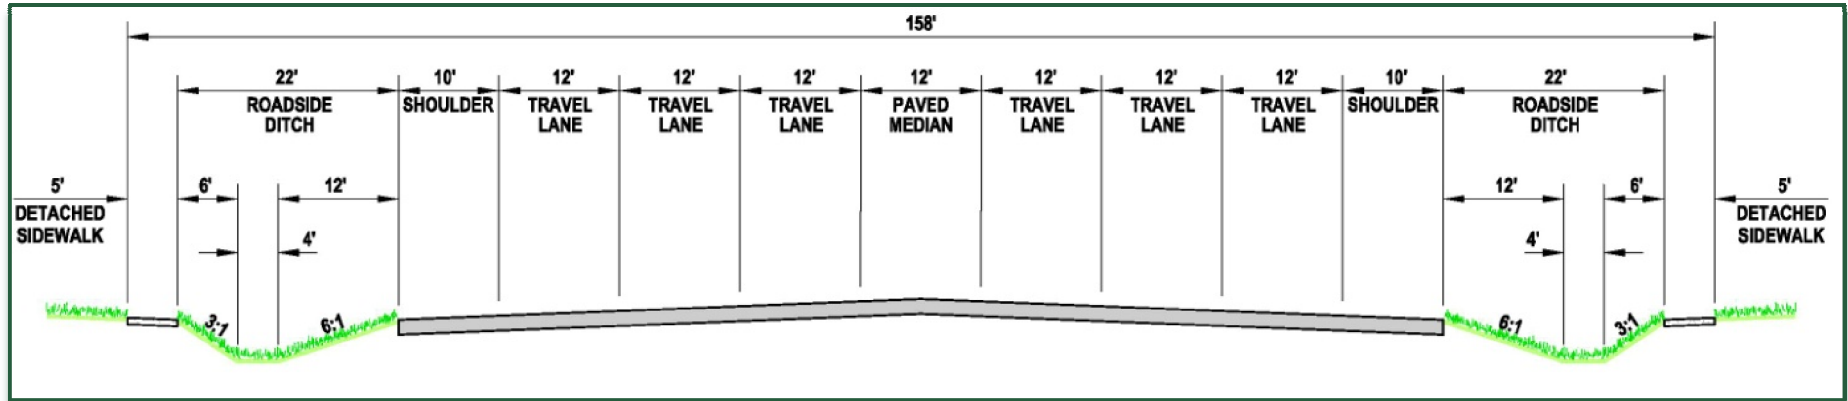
Meet Basic Needs package - Segment 2 (119th Street to Sheridan Parkway) and Segments 4 & 5 (York Street to US 85) Cross-Section
